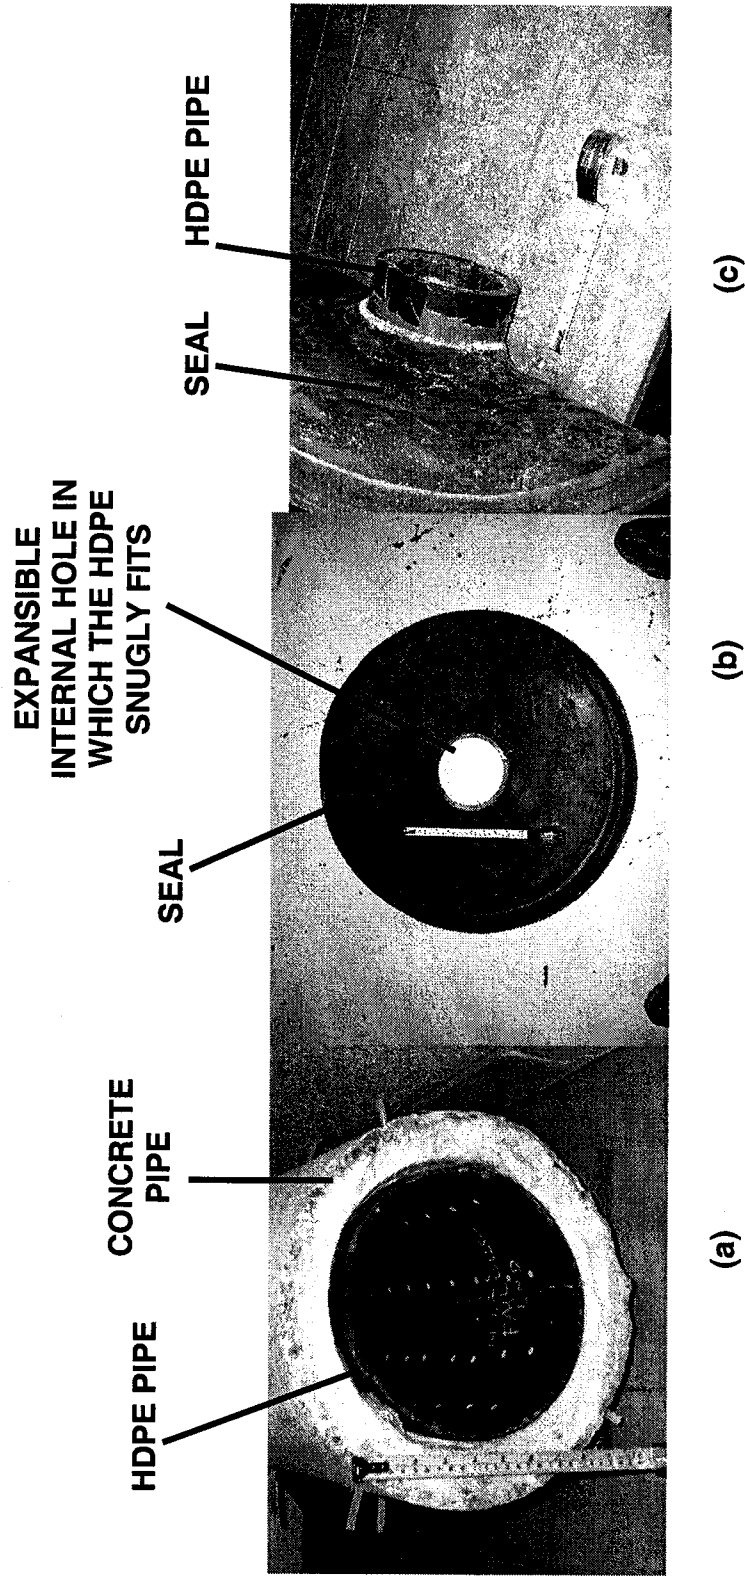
PHOTOGRAPH OF THE TEST WHERE THE SEAL USED BY BOOT AND WELCH
